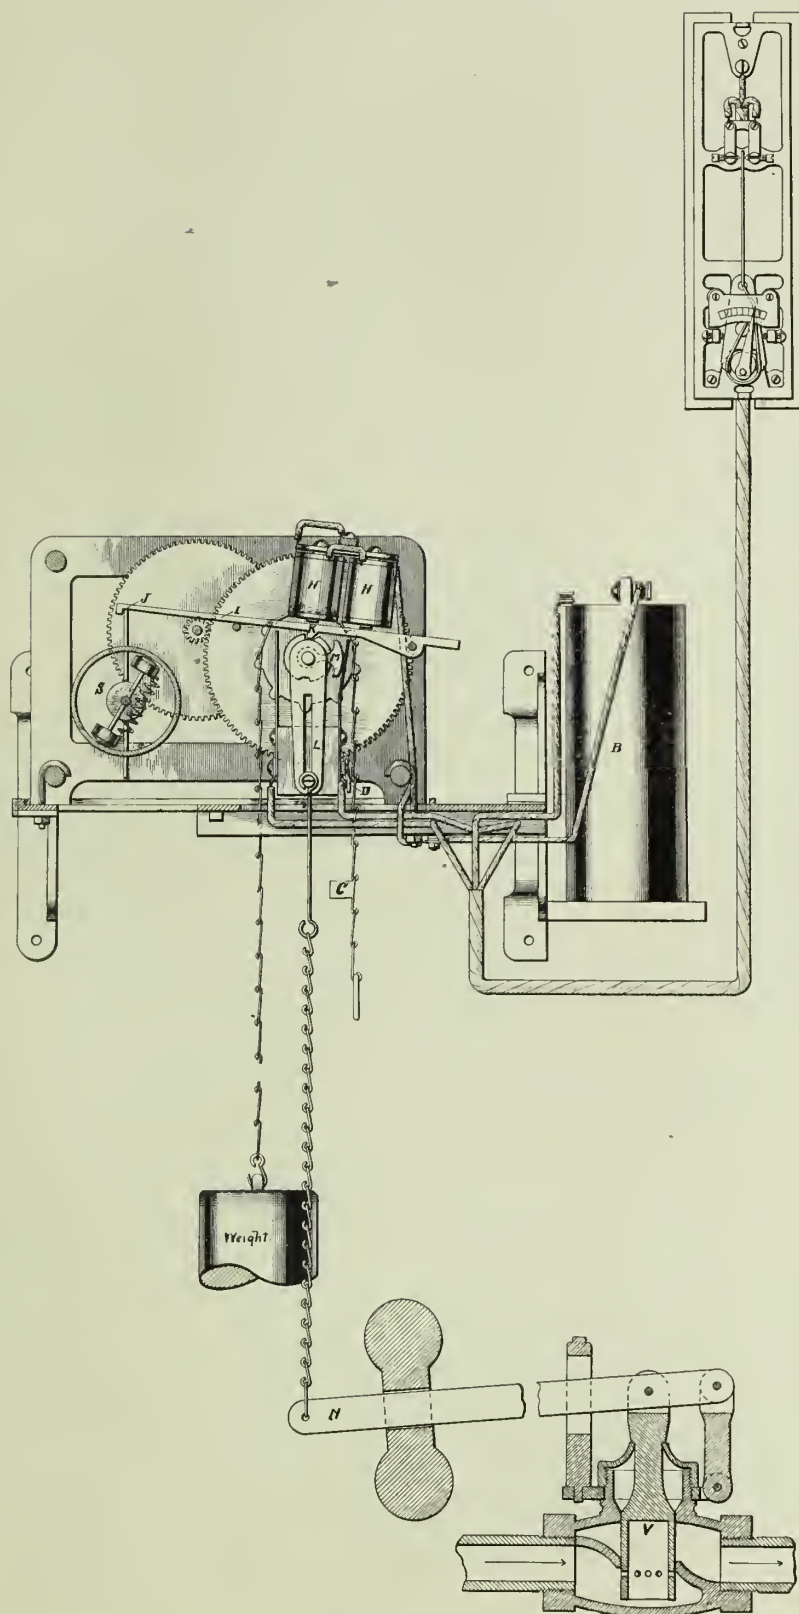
Thermostat complete with the regulator, battery and motor attached to a steam supply valve.
